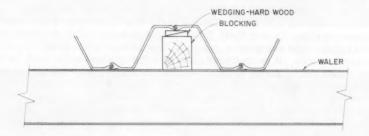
BACKING OF STEEL SHEET PILING TO PREVENT DISTORTION
